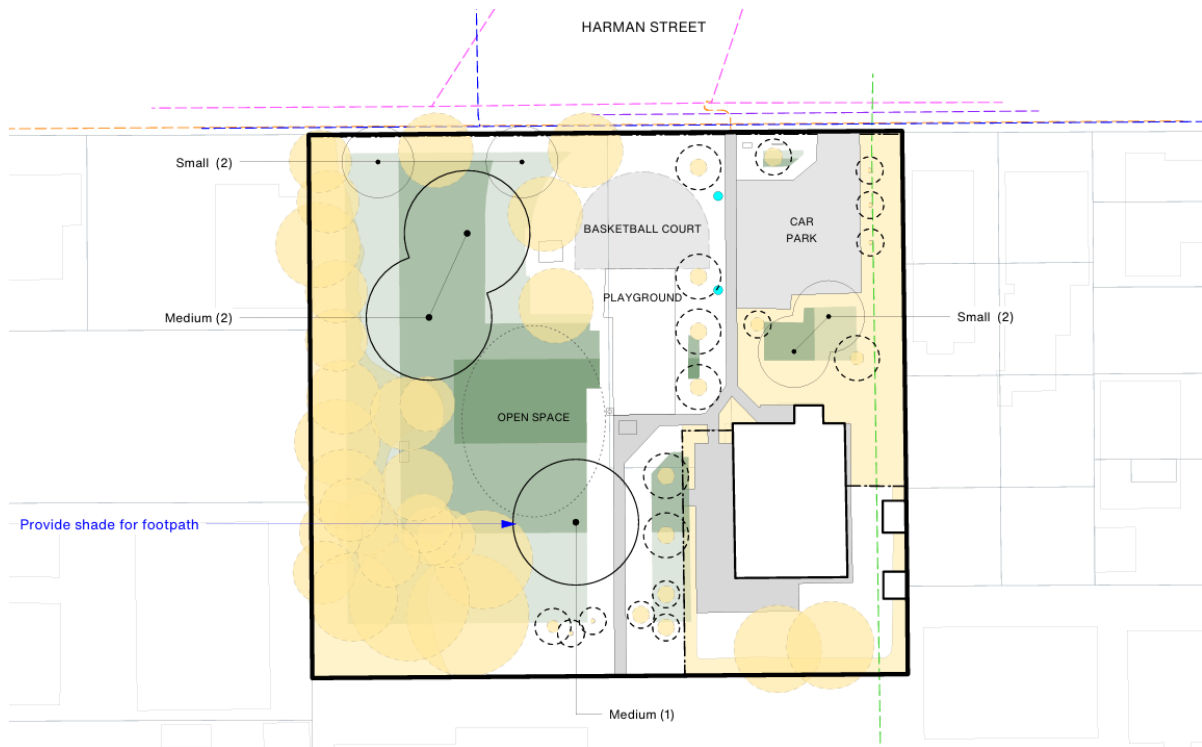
Proposed Cornelius O'Conner Reserve Tree Planting Plan
